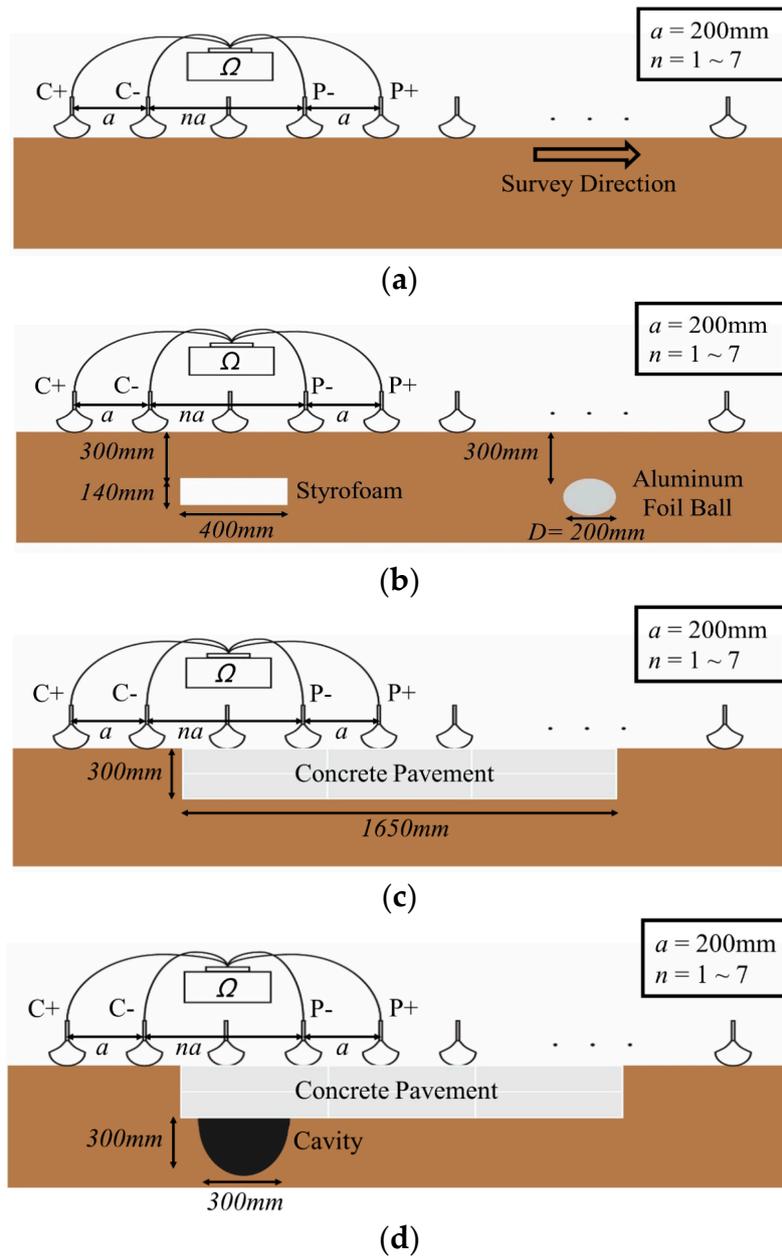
Cases for field experiment: (a) field ground without cavity; (b) field ground with cavity; (c) concrete pavement without cavity; (d) concrete pavement with cavity.
